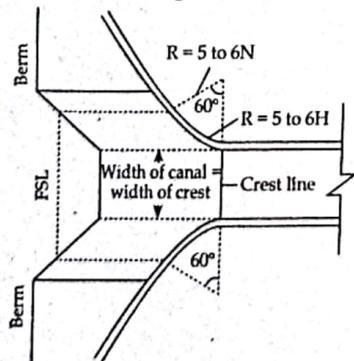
u/s wing walls for trapezoidal crest of sarda type fall
